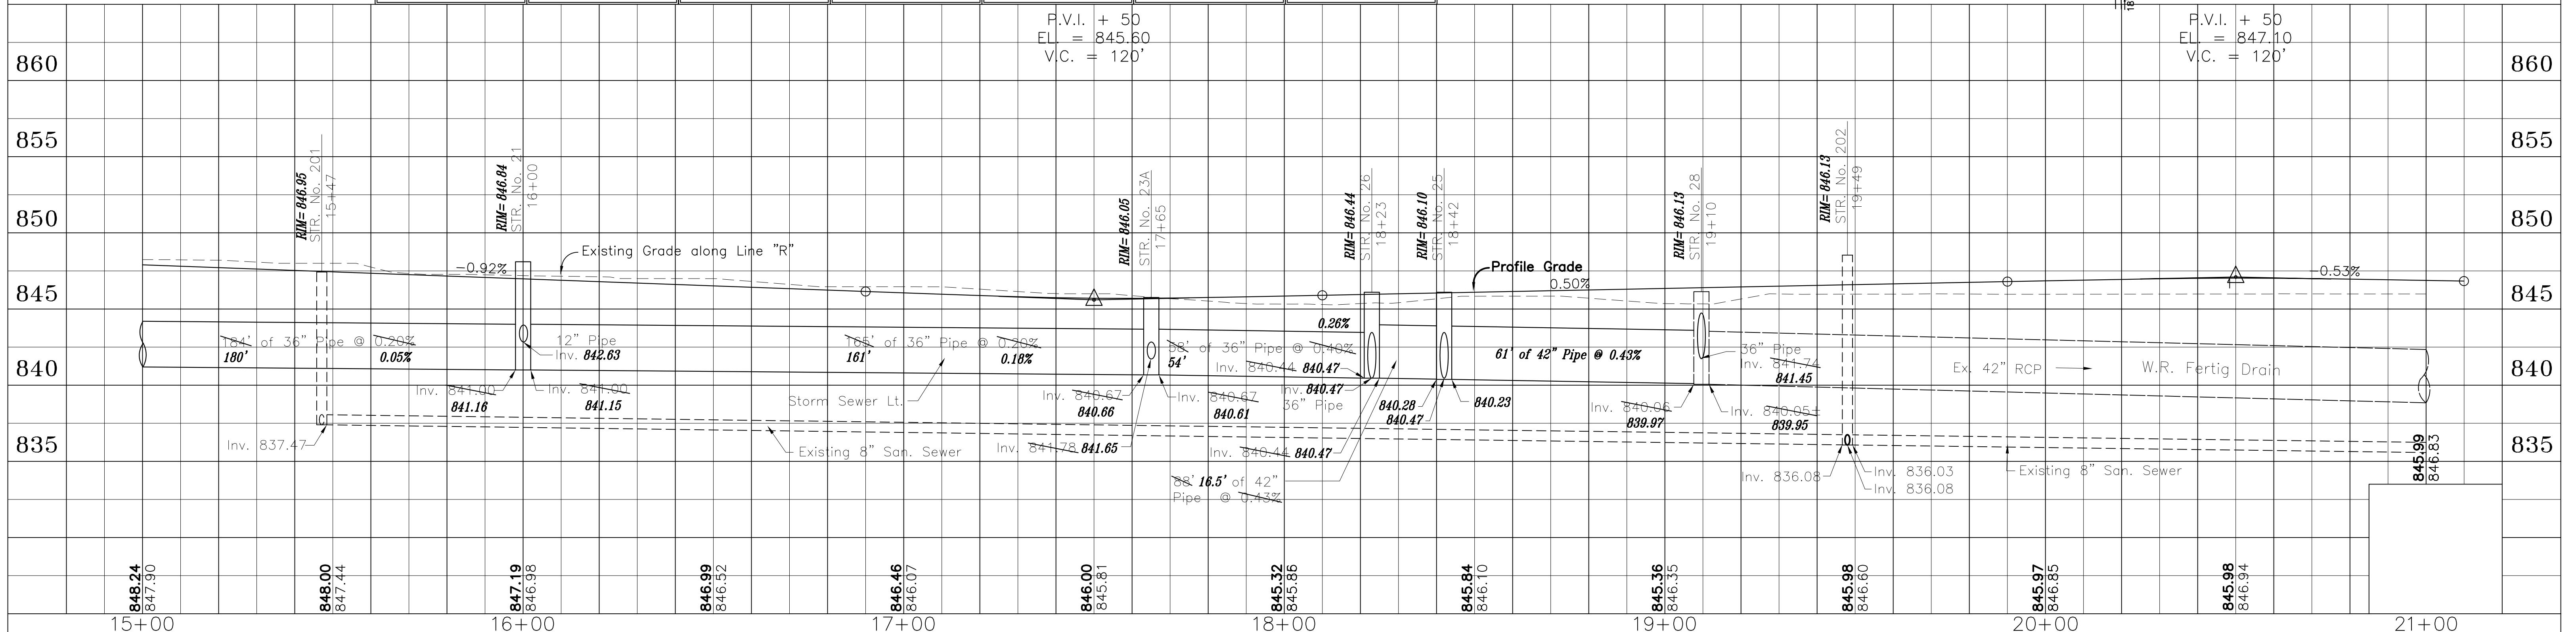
PLAN-PROFILE B. R. R. STANDARD
